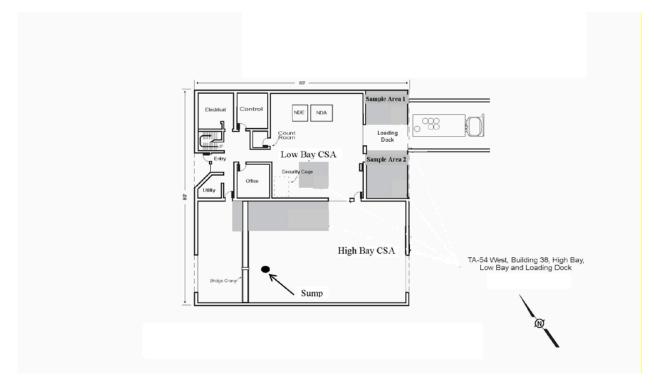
Technical Area 54, Building 38 (High, Low Bay, and Loading Dock Sampling Locations)
